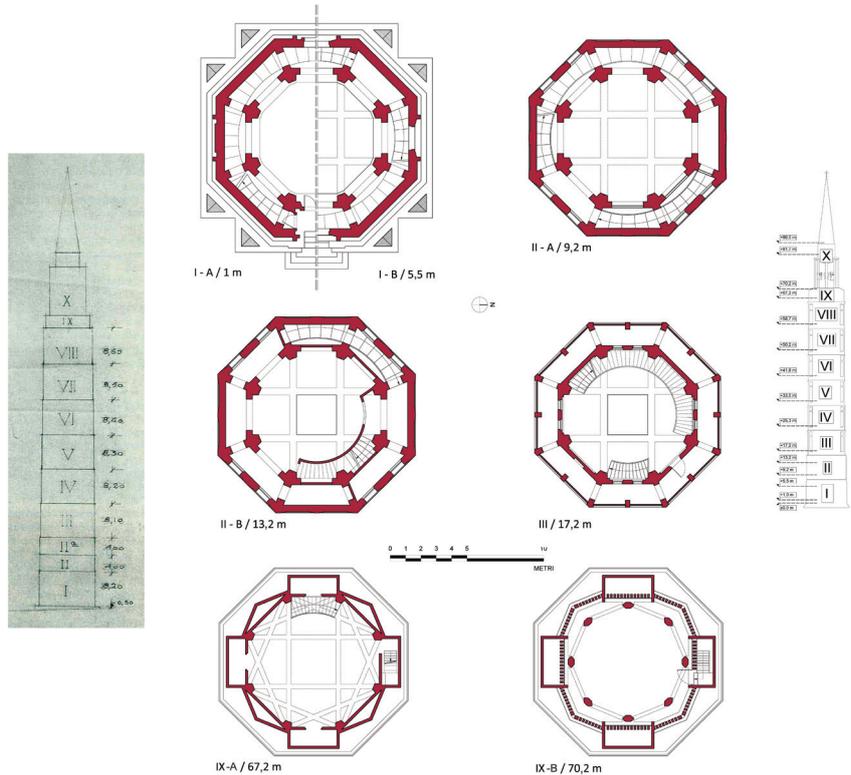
Floor plans at the various levels of the bell tower. Graphic elaboration by Mohamed El Ouajjay.
